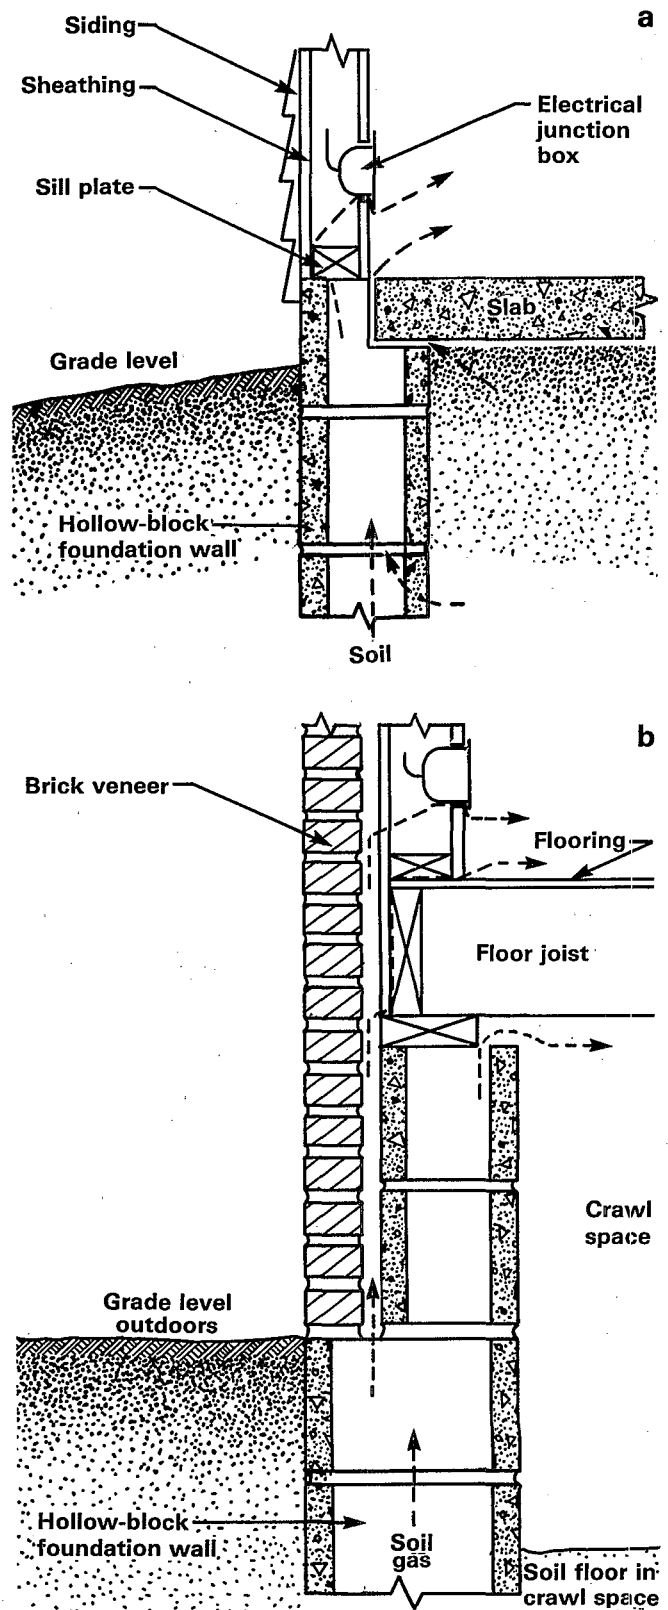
Hollow-block foundation walls as a conduit for soil gas into a) slab-on-grade and b) crawl space houses.
